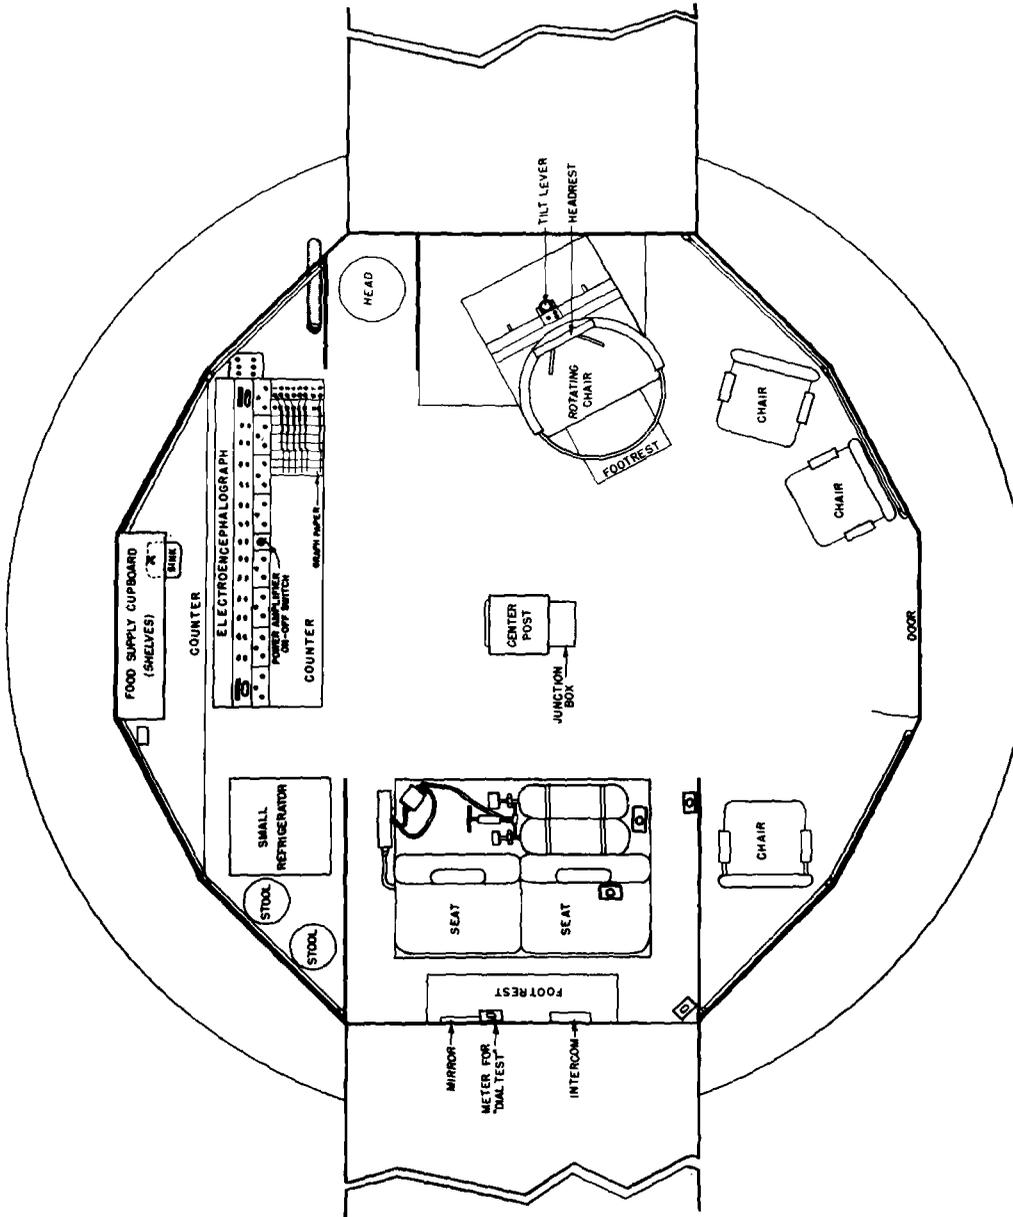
Floor plan of Pensacola Slow Rotation Room.
